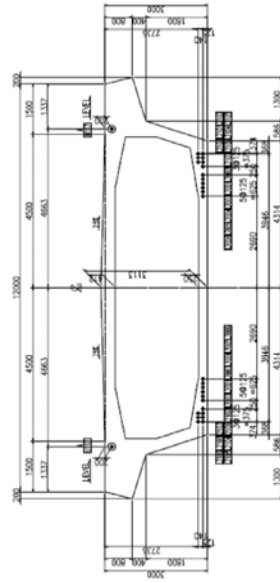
Cross-section of PC-Girder (Center of the Center Span)
